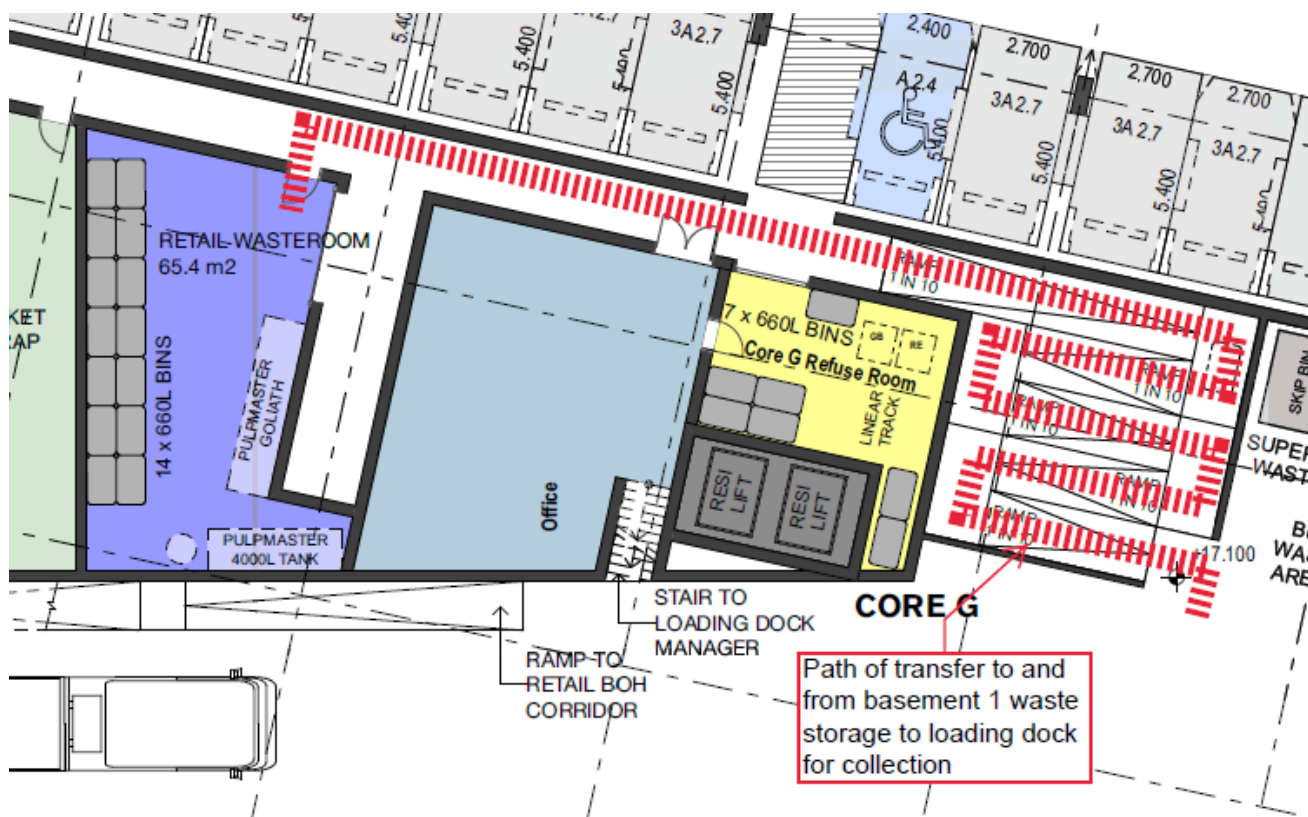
shows the basement 1 waste storage area and the path of access to transfer bins to loading dock for collection.
